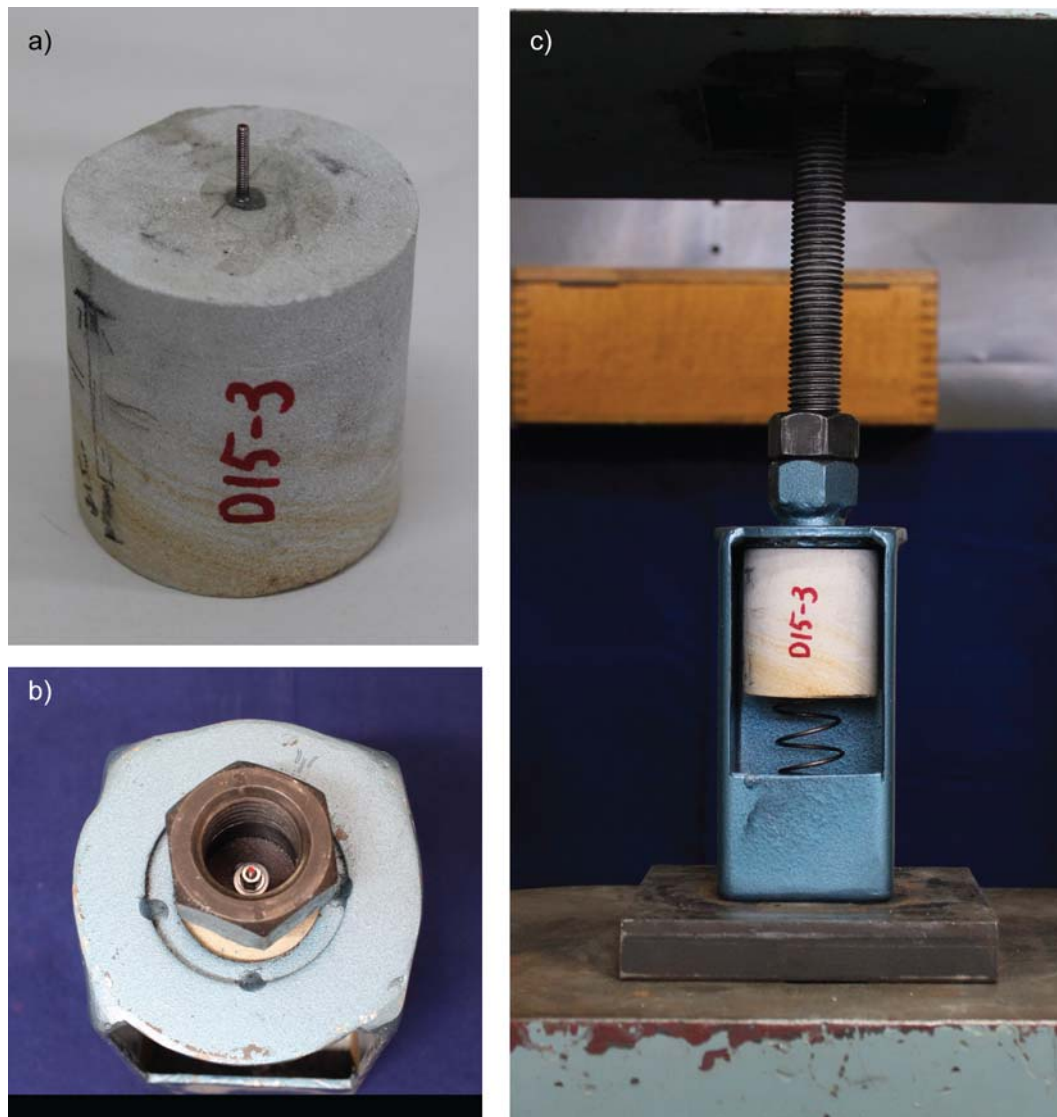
The setting for the rock bolt tensile test by Avery loading machine a) a test sample b) bolt head fixed by nut c) pull testing configuration.
